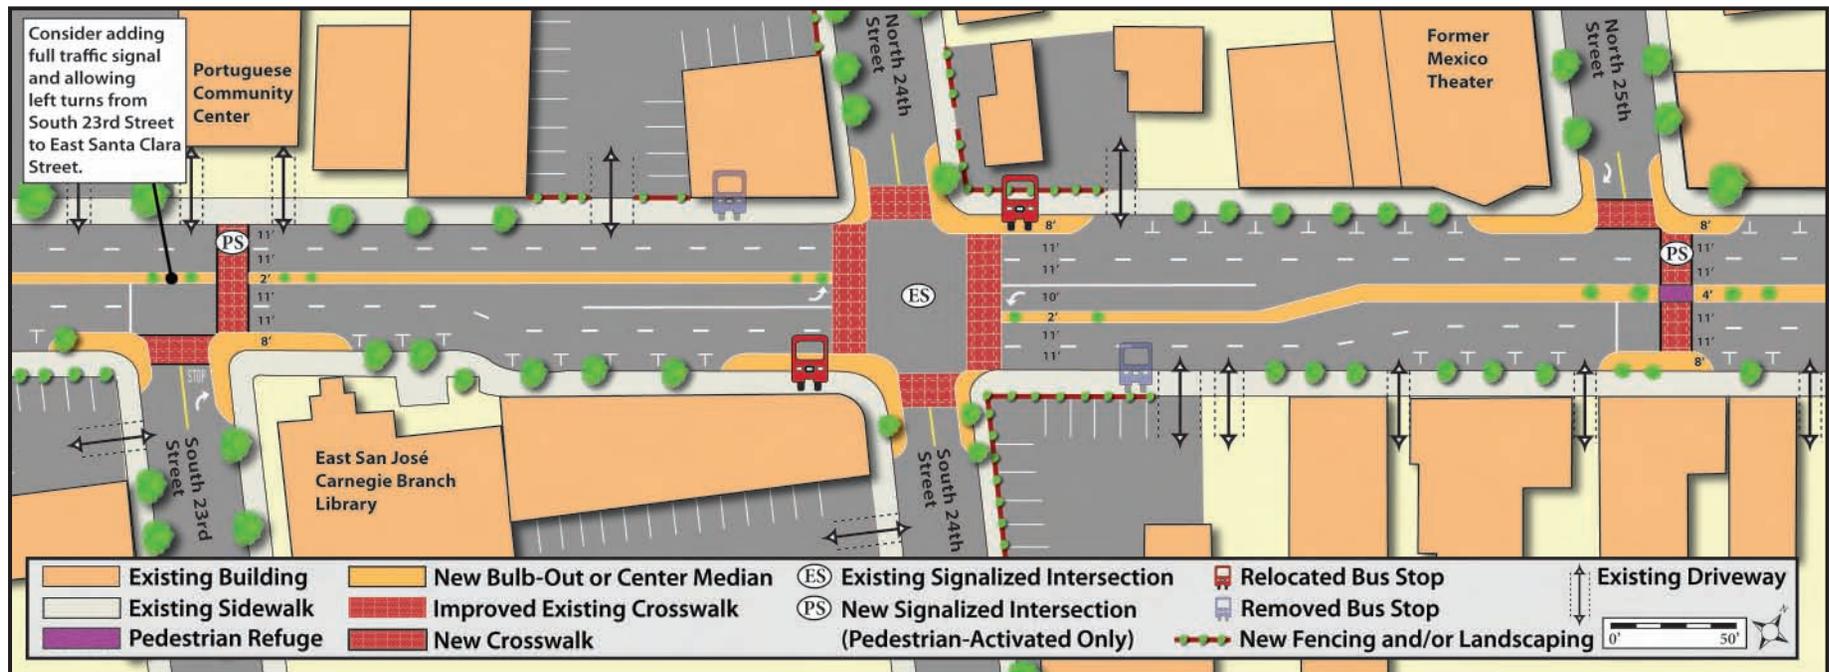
East Santa Clara Street/Alum Rock Avenue - Segment #3.
